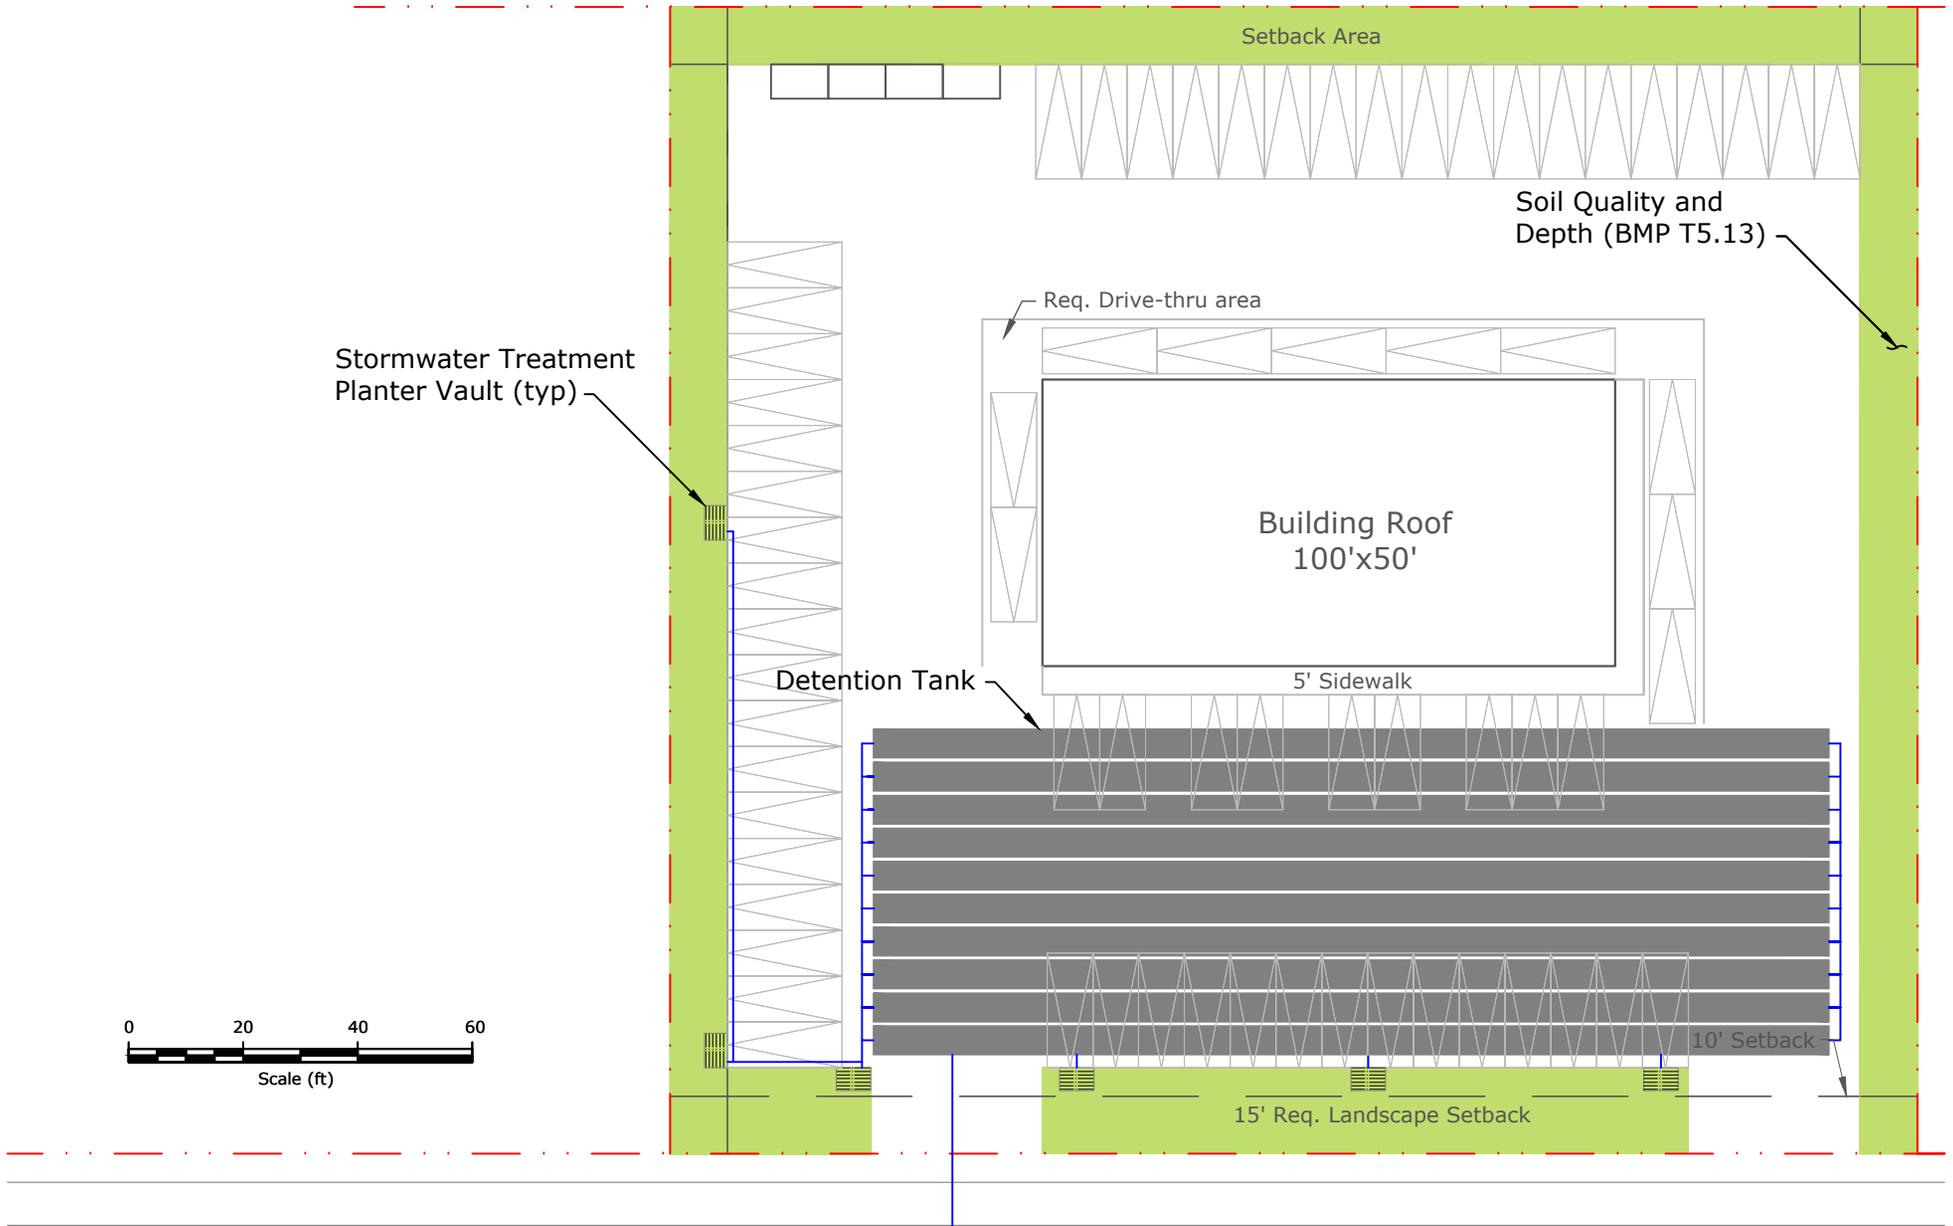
Scenario 8. Permanent Stormwater Site Plan – Small Commercial Development, 2005 Requirements, Till Soils
